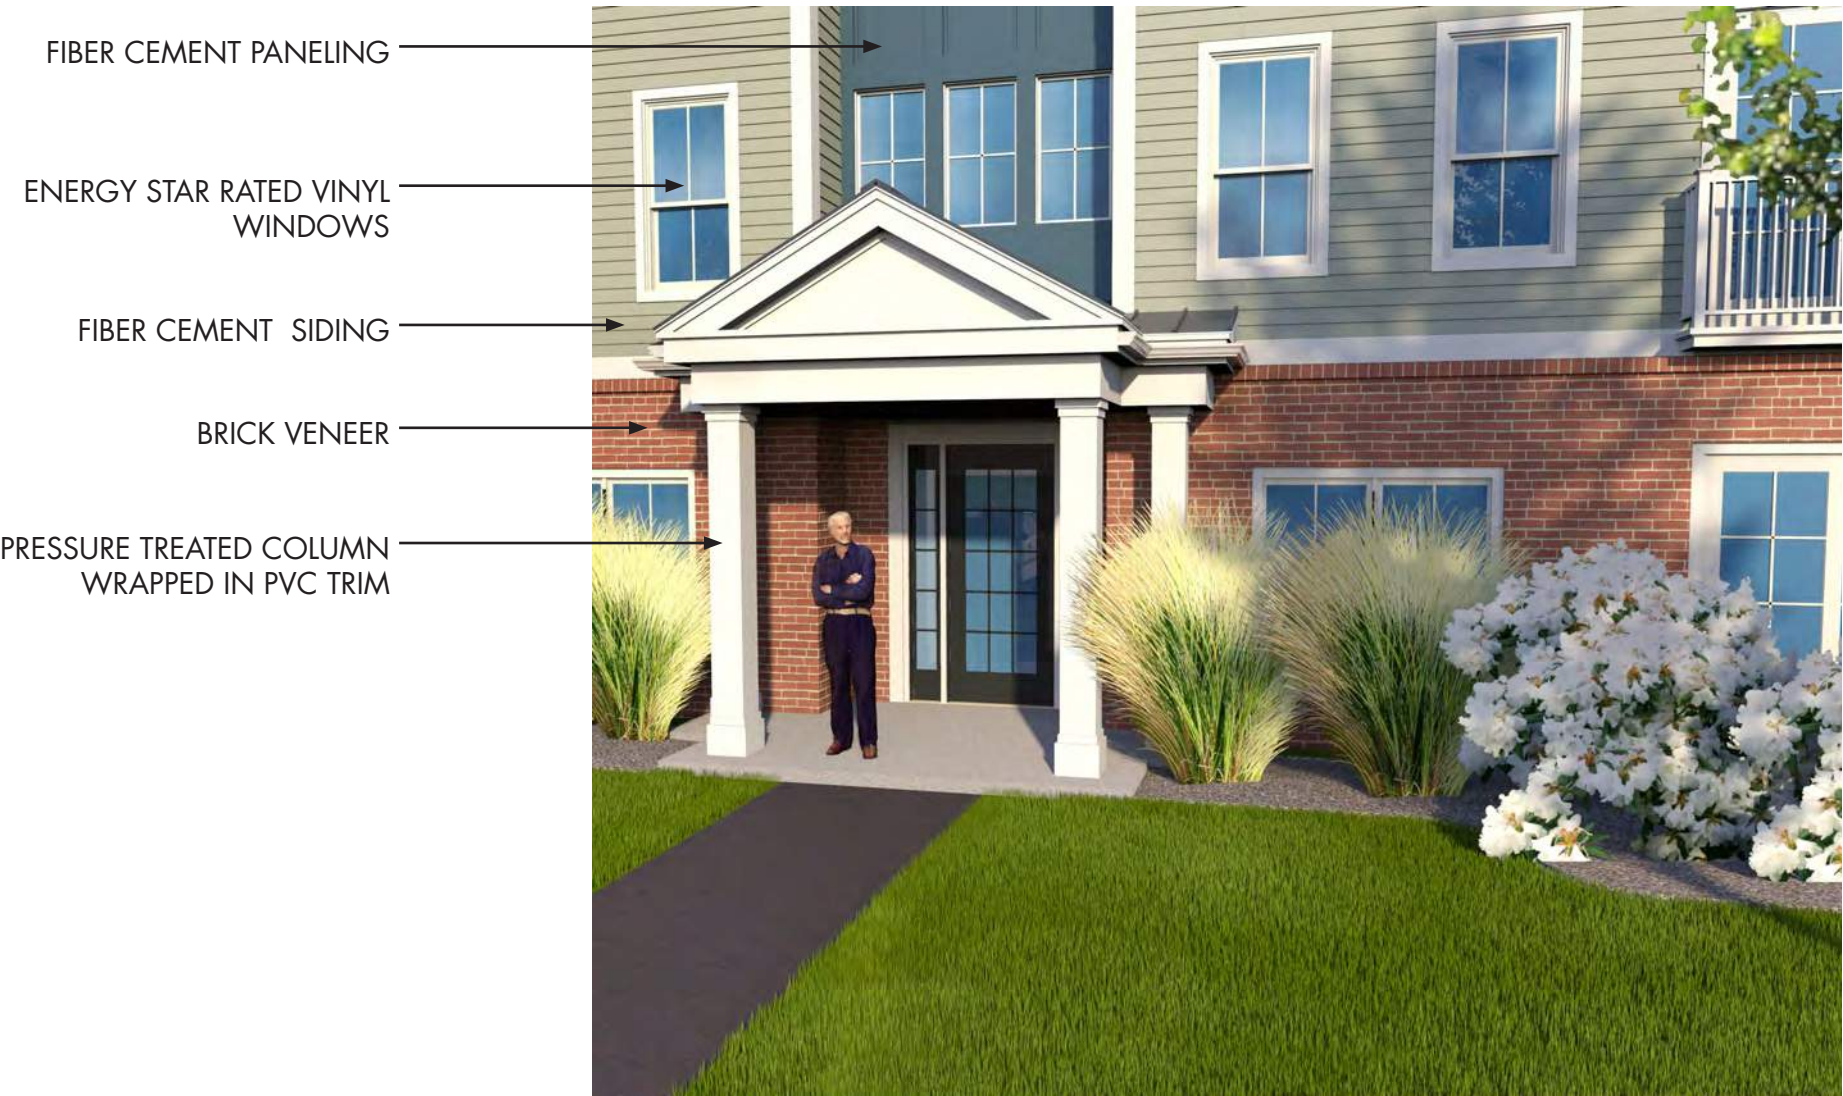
EXHIBIT E - ARCHITECTURAL RENDERINGS - TYPICAL FRONT ELEVATION
